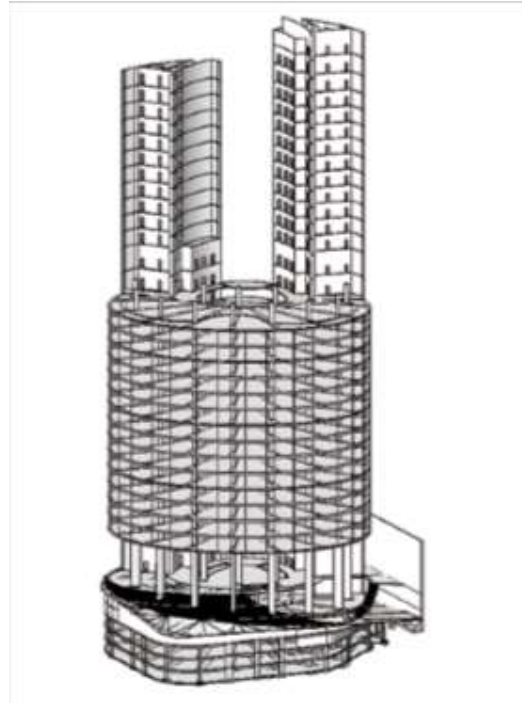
3D Structural Model Developed for the Bligh Street Project
